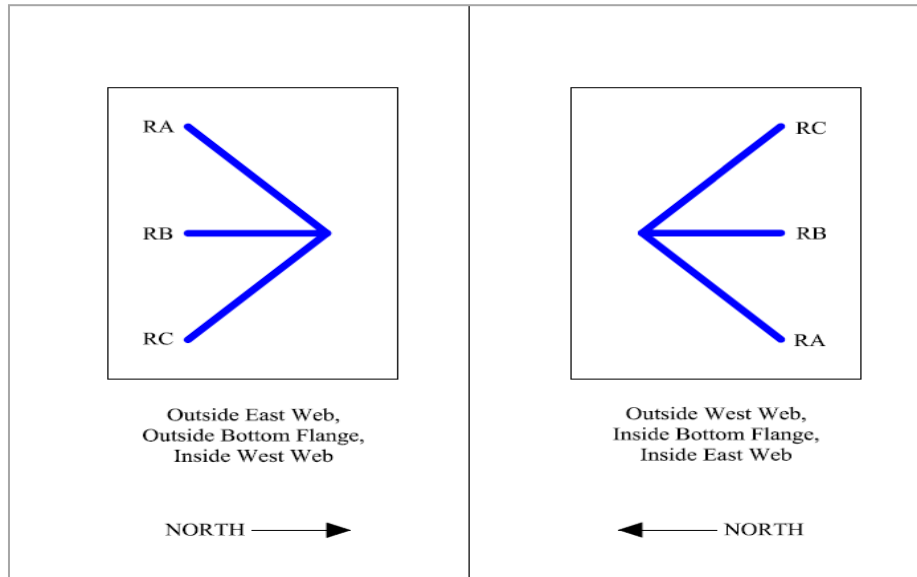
Intact girder rosette orientation Full-Scale Test 2 and 3
